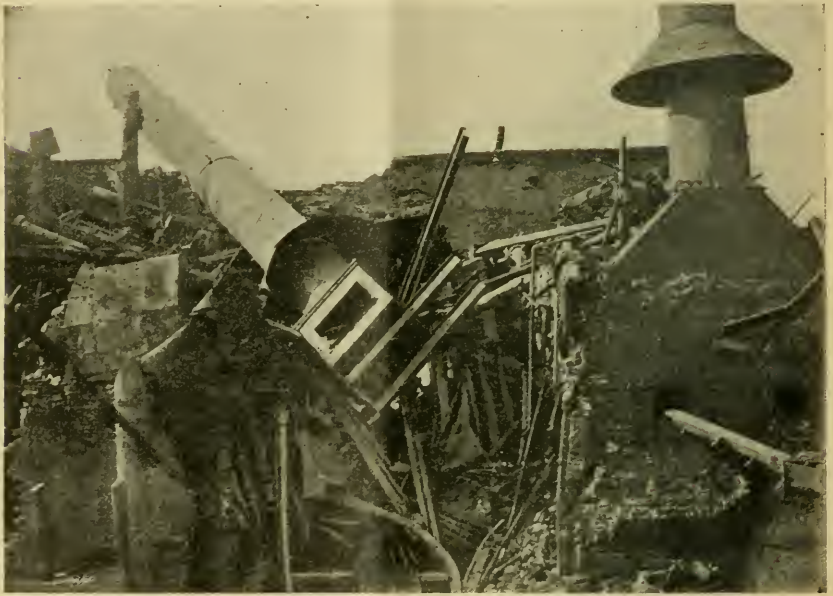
DETAIL VIEW OF THE DESTROYED POWER PLANT.
